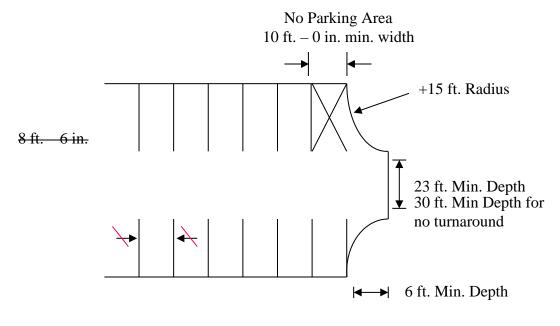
Typical Turnaround Design for 90° Parking Access Drive
